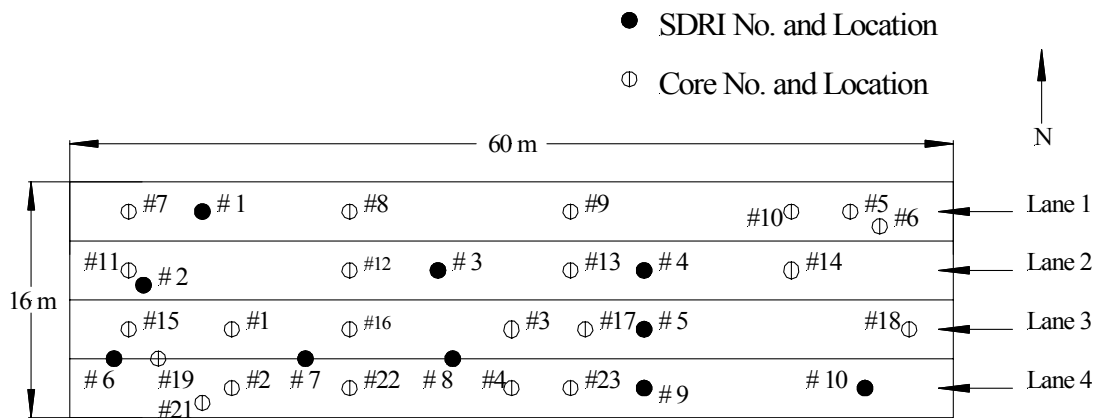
Plan View of the Layout of the Asphalt-Based Barrier Test Pad Showing Locations of Sealed, Double-Ring Infiltrimeters (SDRIs) and Core Samples.
